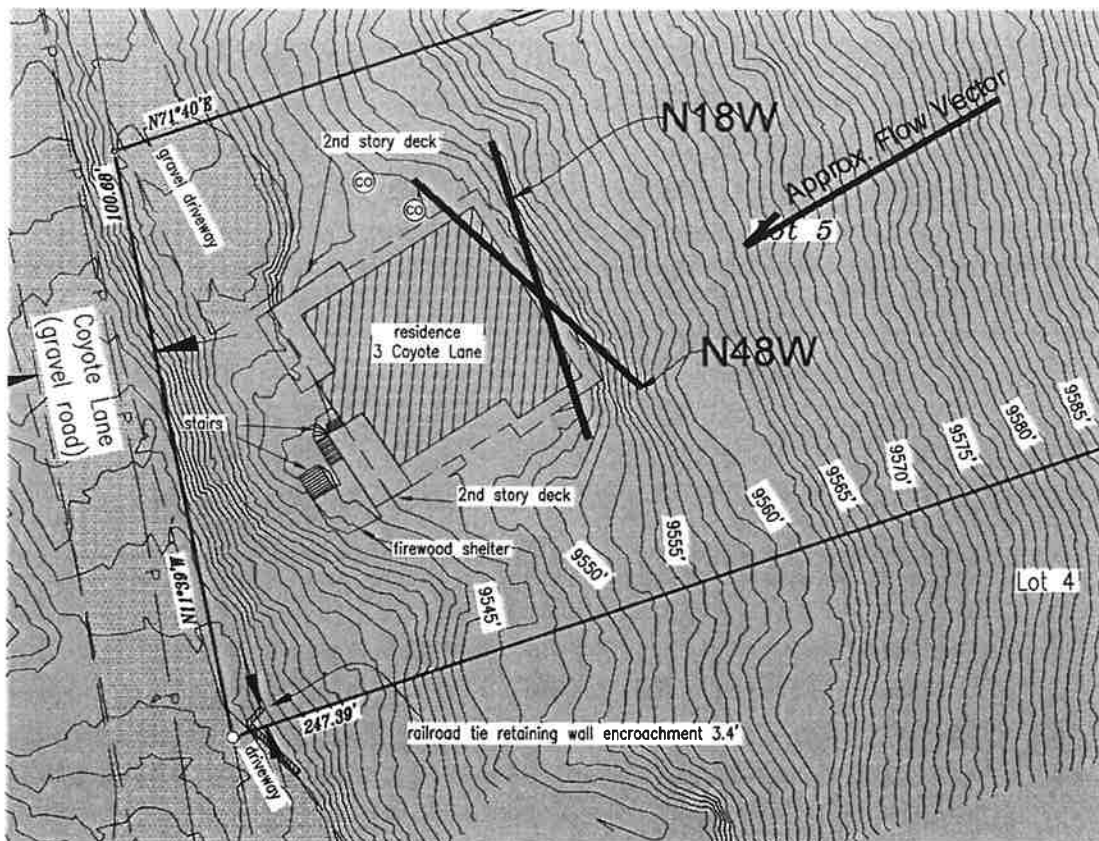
Recommended Wall Orientation Limits for Direct Protection
